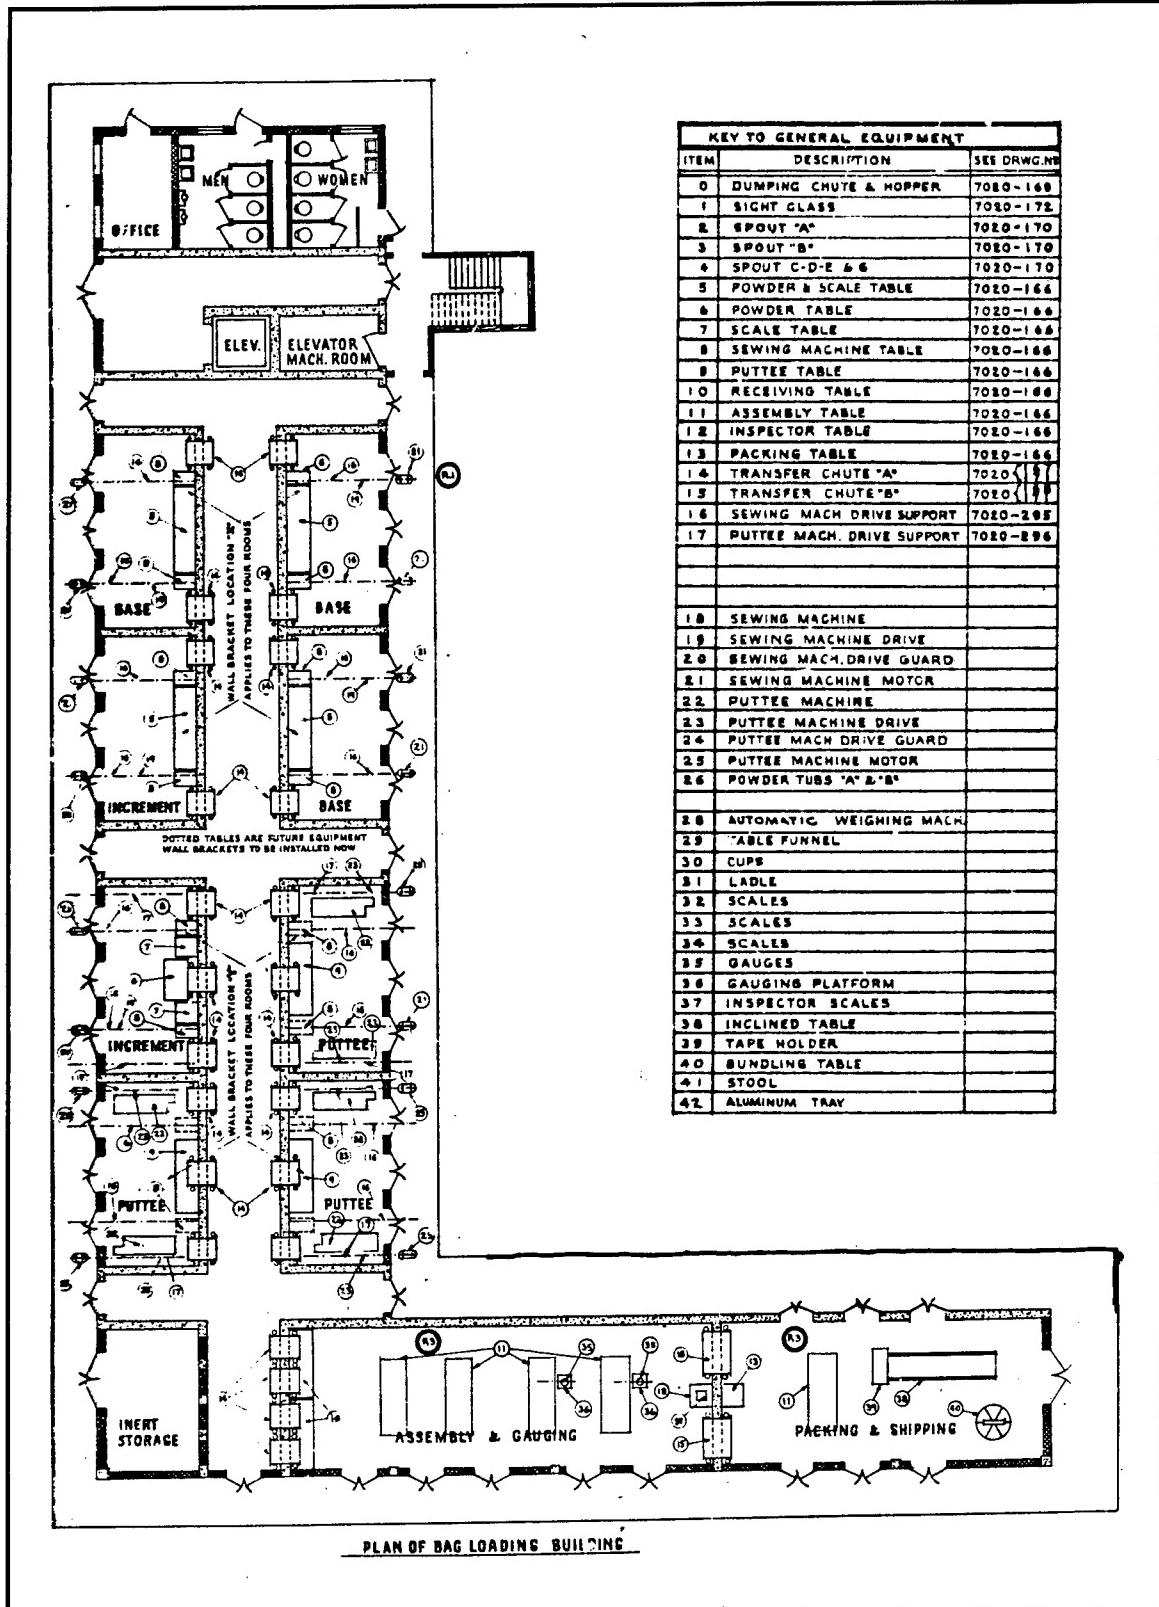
Floor plan of the LAP buildings (buildings 3001-3017, excluding 3010), Hoosier Ordnance Plant (INAAP Drawing 7020-165).
